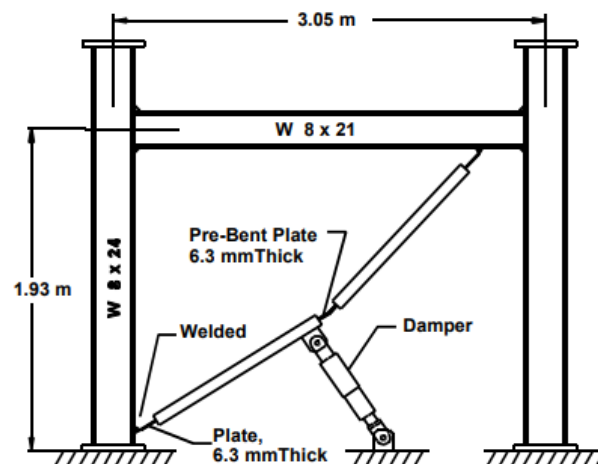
The construction detailing of a typical toggle bracing system with a FVD (Taylor 2000)
